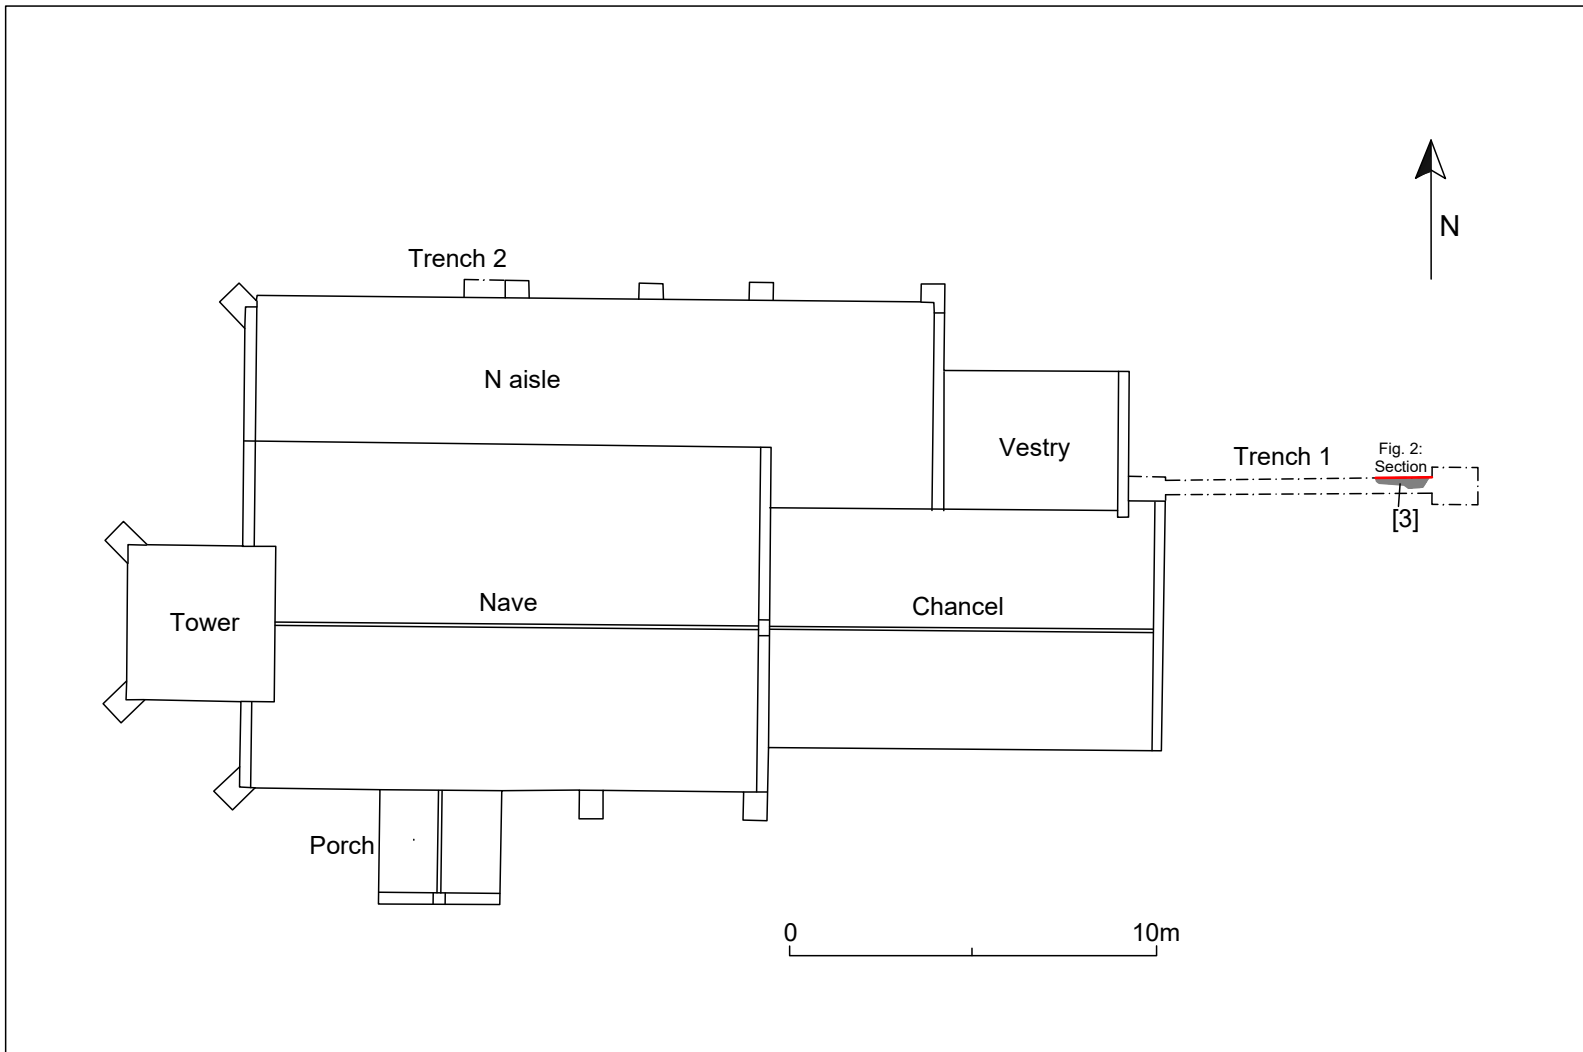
Plan of St Peter's Church with excavated trenches. Scale 1:200
